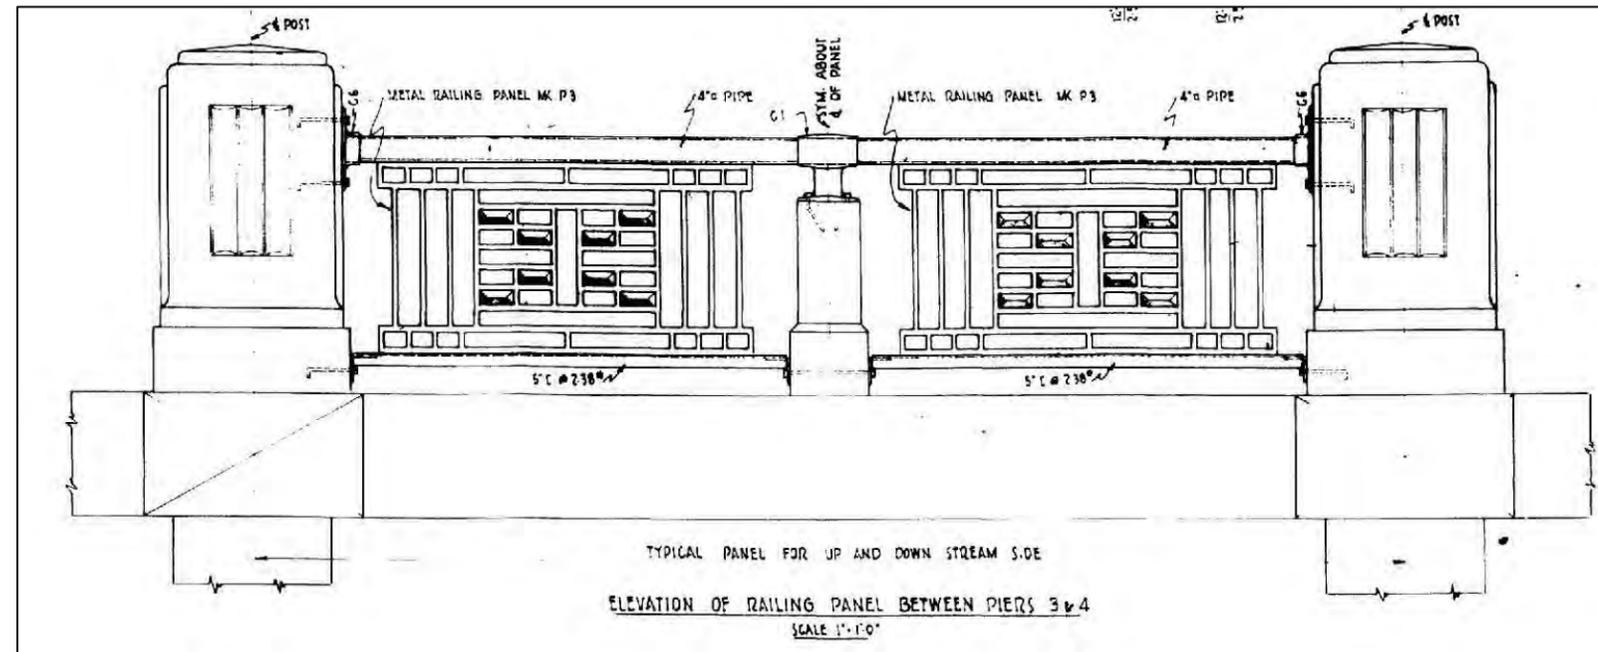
1939 to Present Aluminum Railing with Concrete Pilasters
